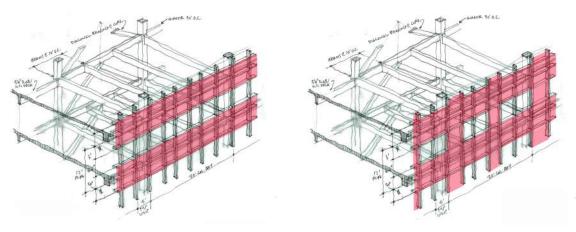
Varying degrees of opacity and structural potential on the elevation correlate to spandrel area; spandrel and column area.
